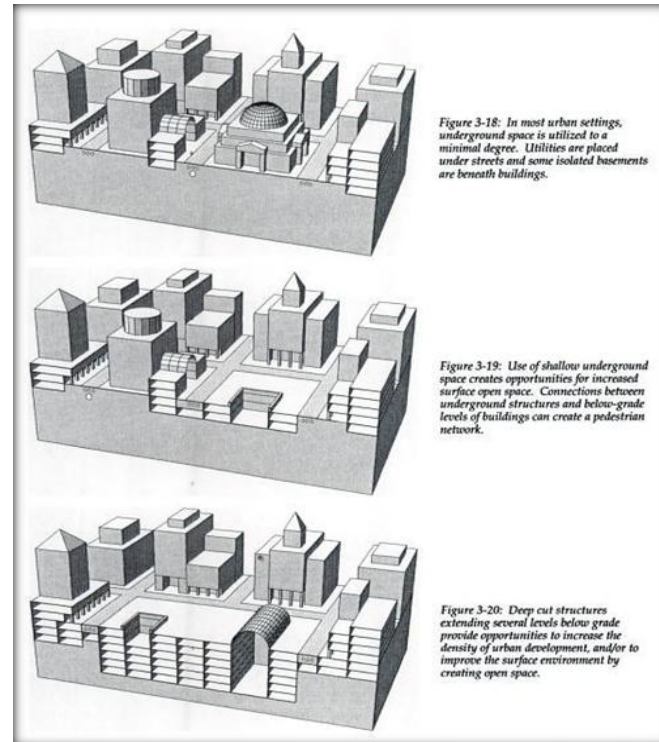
Underground building configurations in urban center (Carmody and Sterling 1993)
